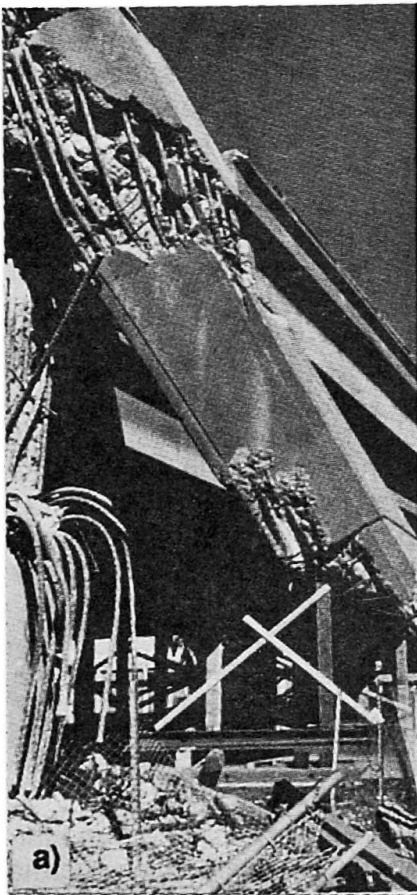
Bridge Damage, Loma Prieta 1989 (M7.1)
